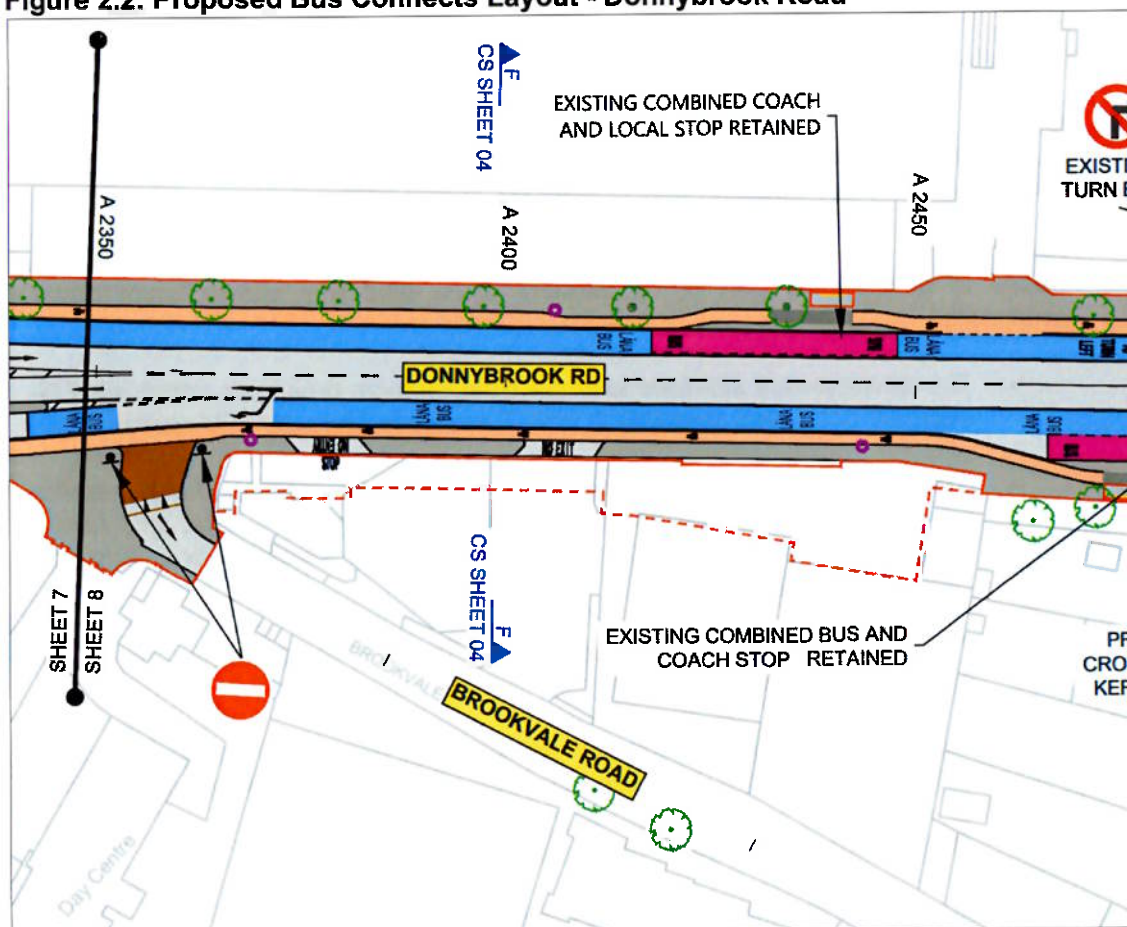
Proposed Bus Connects Layout - Donnybrook Road
